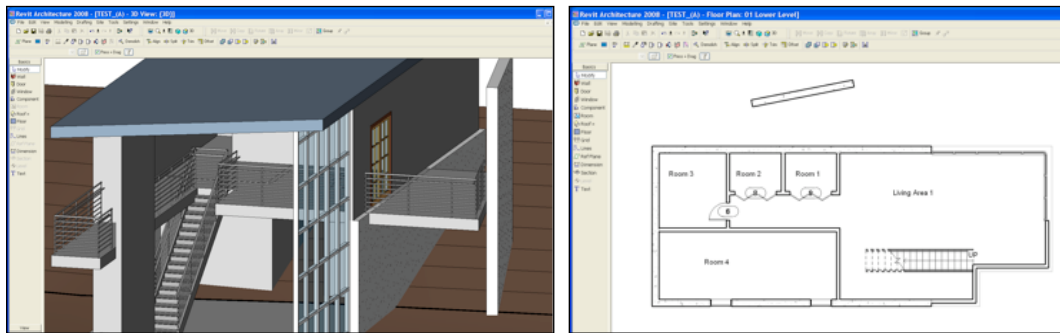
Example of discrepancies in building information model used in experiment: guardrail blocking access at top of stairs and door not present in room 4.
